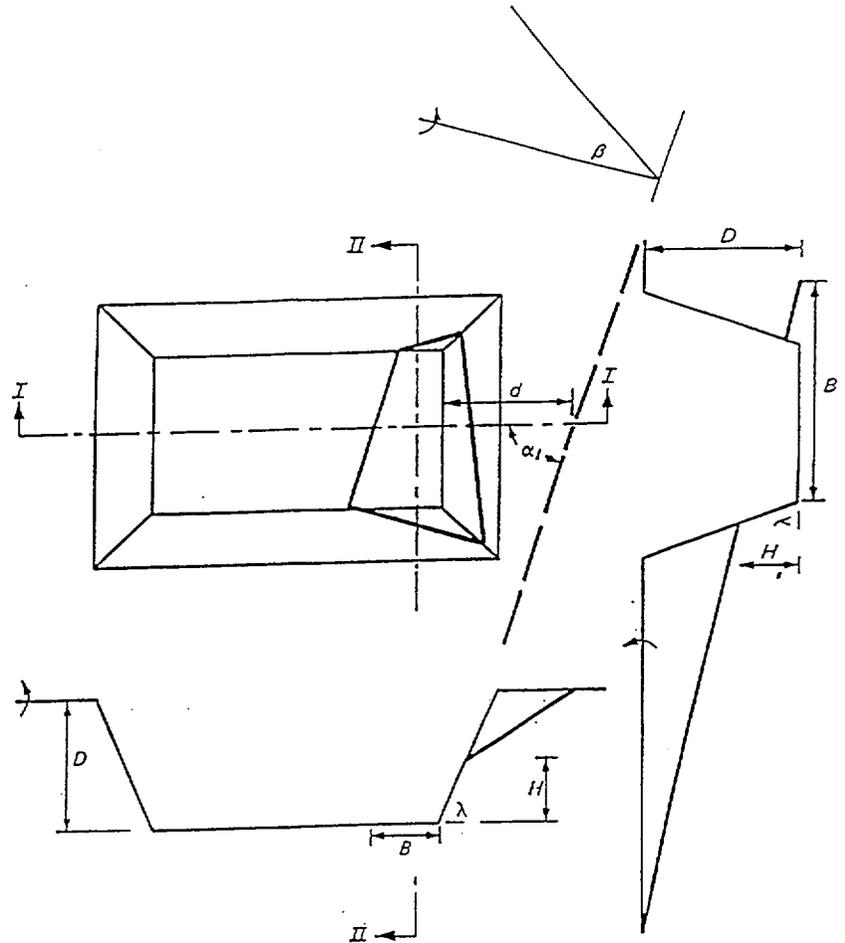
Excavation plan and sections showing intersecting planar feature.
